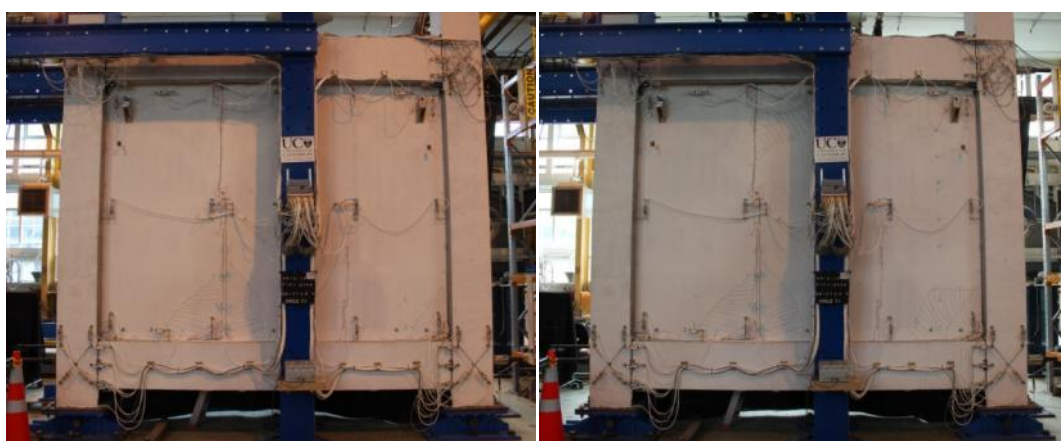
As built steel framed drywall specimen FIF1-STFD: a) 0.5% drift, b) 0.75% drift
